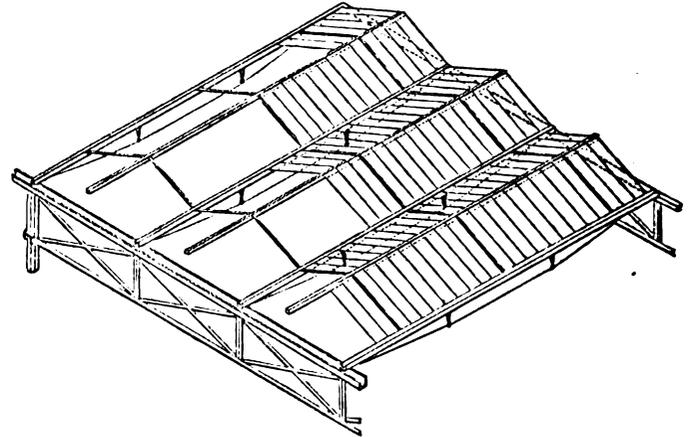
Isometrical View of one 24 feet Bay of Roofing, partly glazed.
